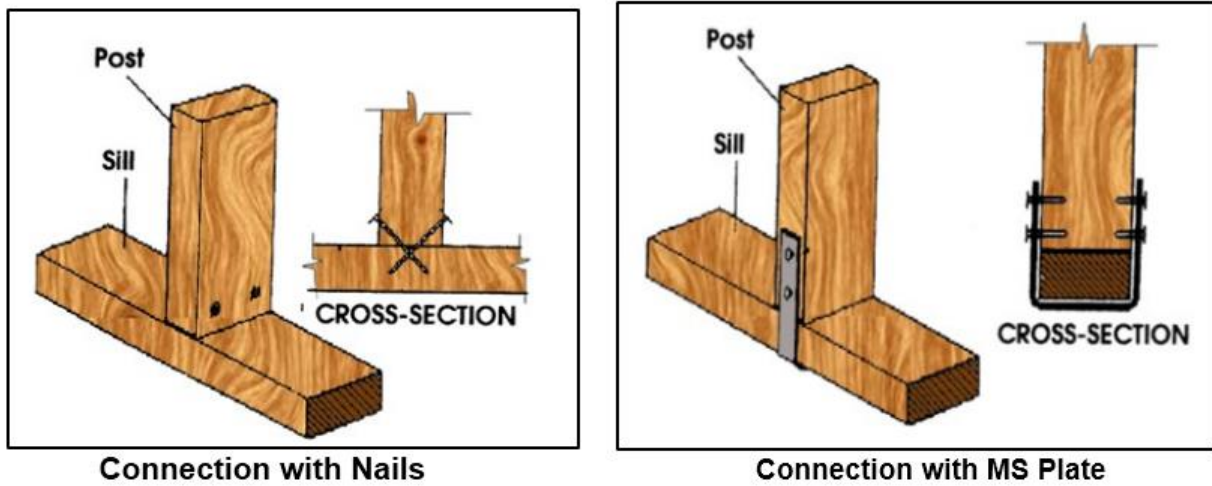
(B) ADDITIONAL CONNECTION DETAILS OF TIMBER WALL FRAME
